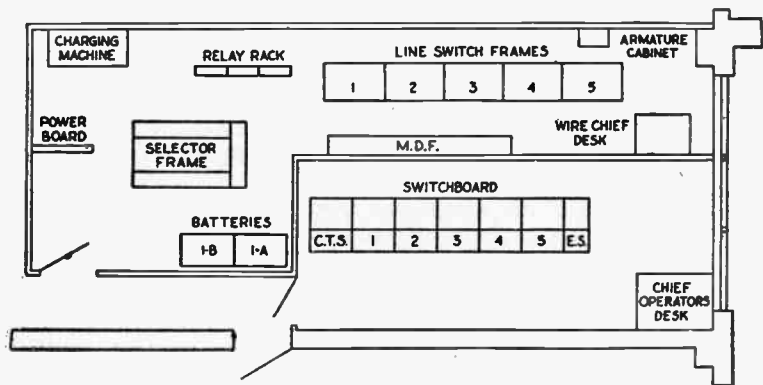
,686.—Typical floor plan of three digit step-by-step Private Branch Exchange.
